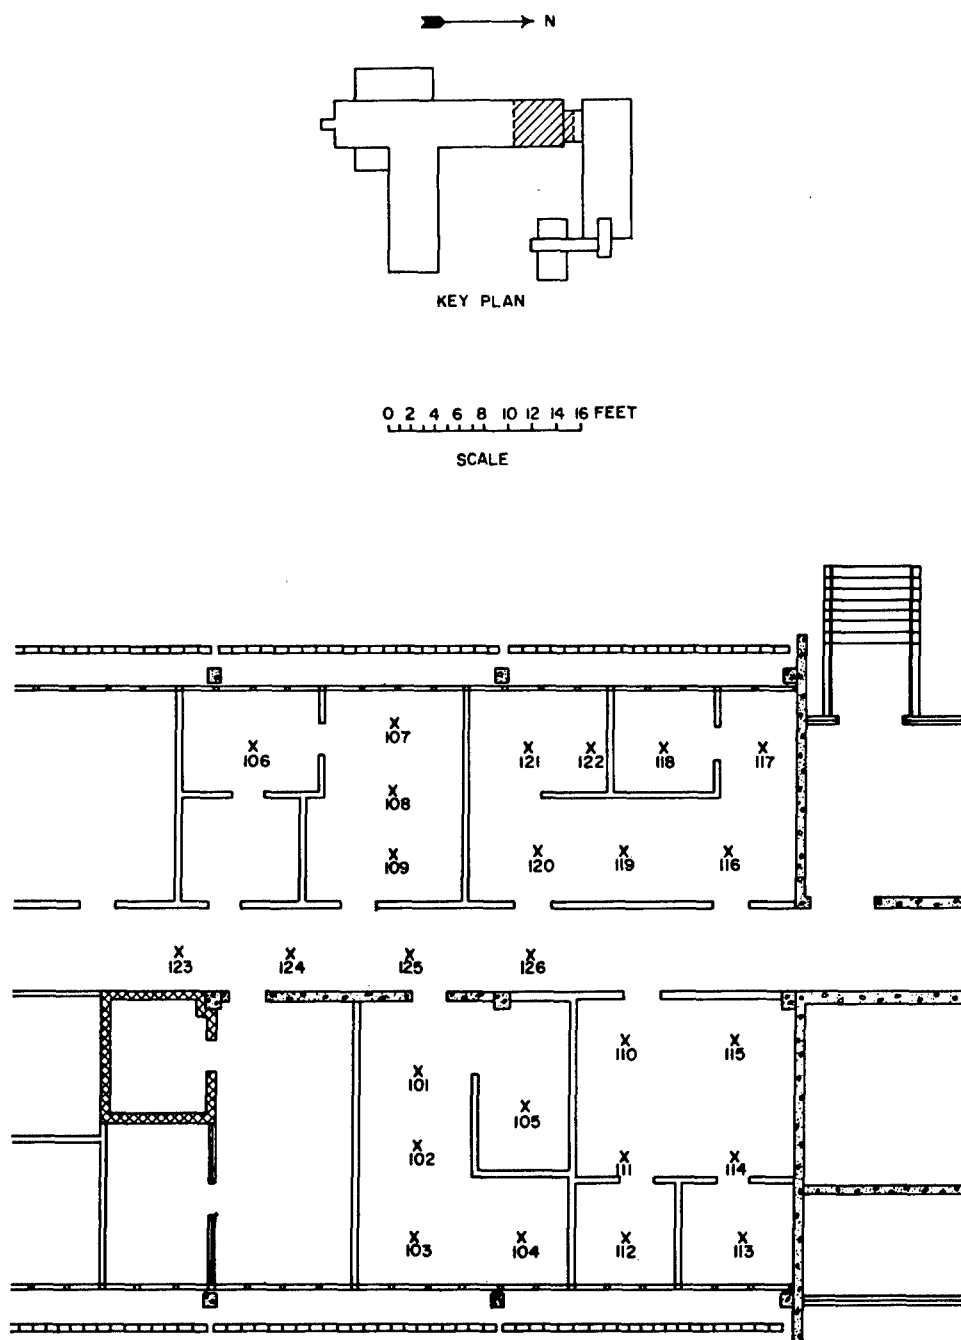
First-floor plan of UCLA structure with detector positions indicated.
